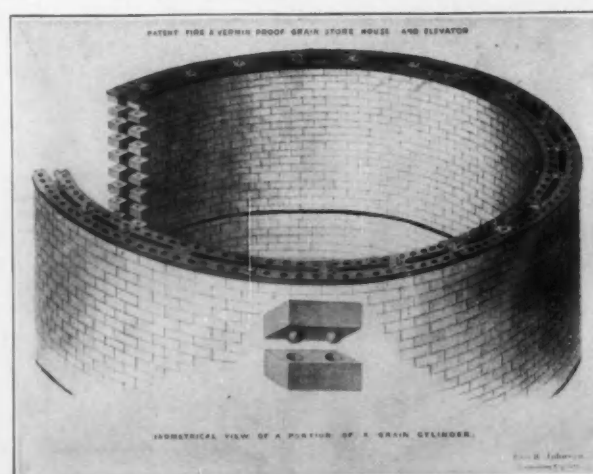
DETAIL OF BIN CONSTRUCTION OF FIRST BRICK GRAIN ELEVATOR, BUILT AT BUFFALO, N. Y., 1869.
